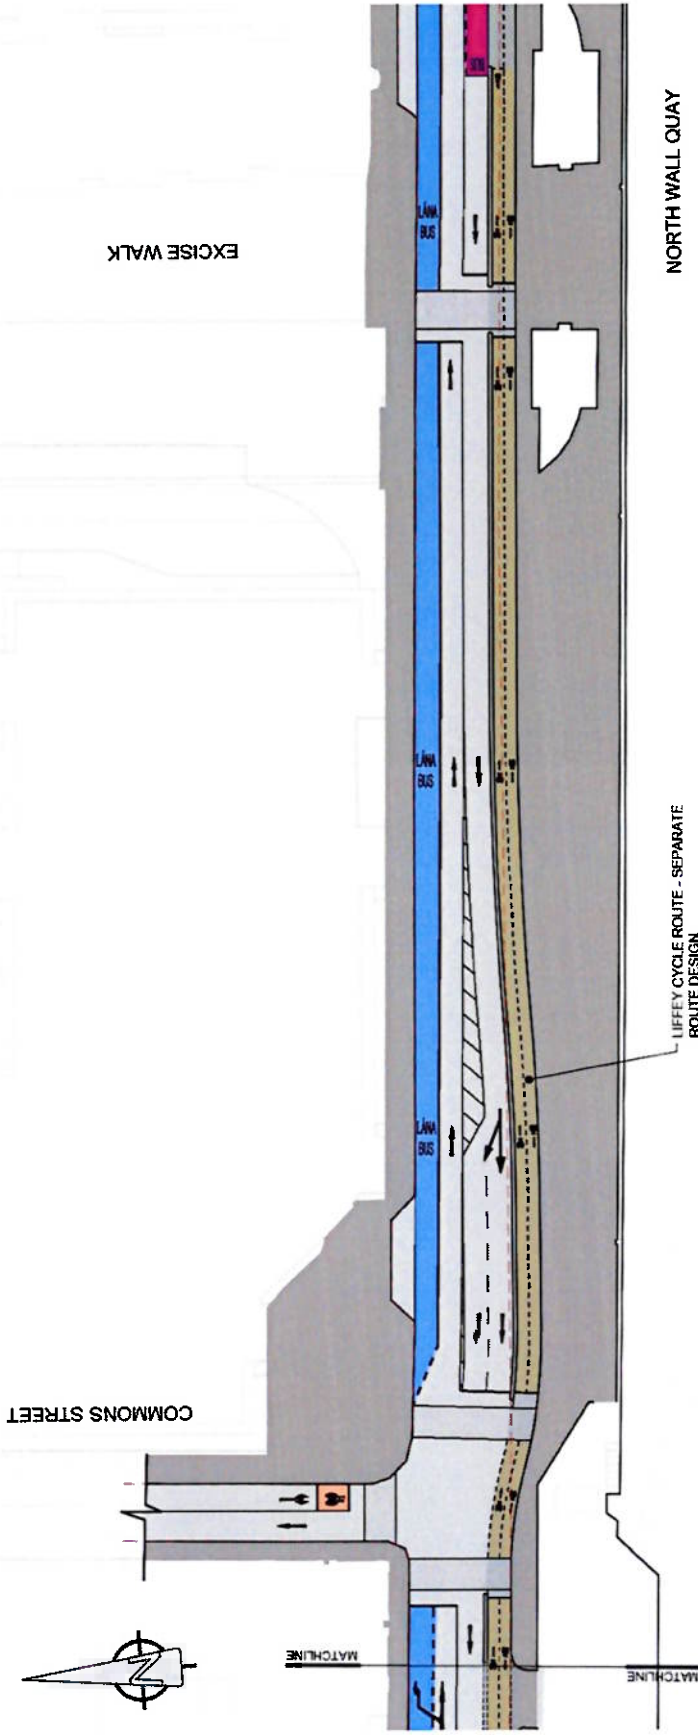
Existing Right Turn from North Wall Quay to Commons Street
